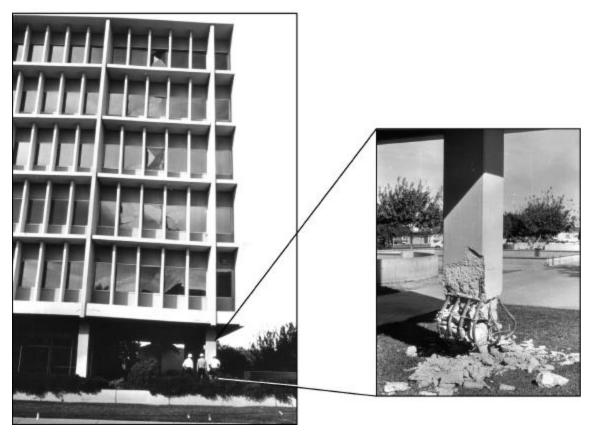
Photos of south face (left) and failed reinforced concrete column (right) at base of Imperial County Services Building, which was damaged by the 1979 Imperial Valley Earthquake. The burst of high frequency motion occurring simultaneously with column failure is shown in Figure 3 (from Rojahn and Mork, 1982).
